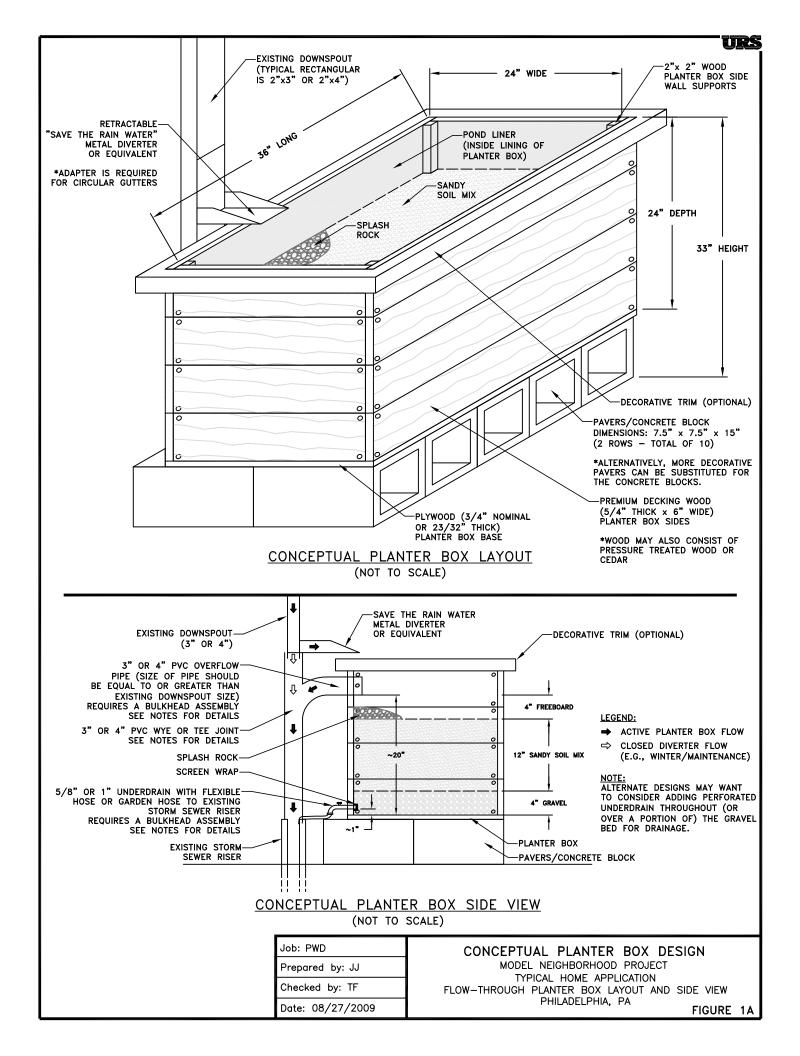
A - FLOW-THROUGH PLANTER BOX LAYOUT AND SIDE VIEW
